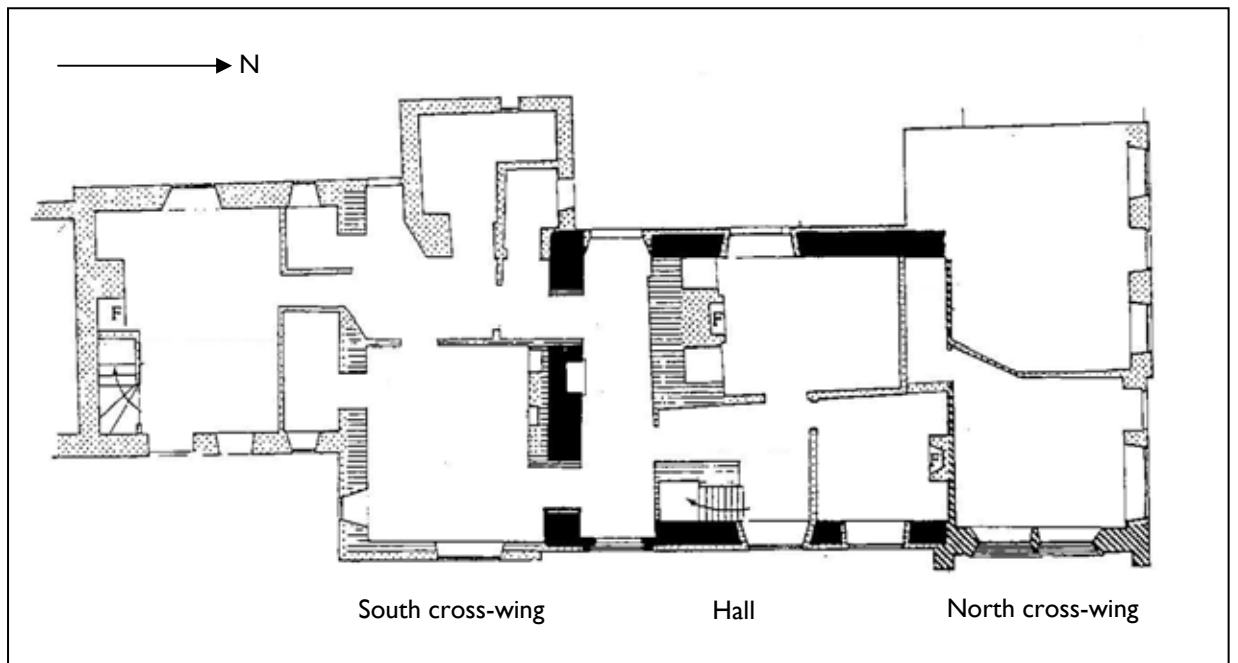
Flore's House ground floor plan (based on a drawing by M W Barley 1975)
